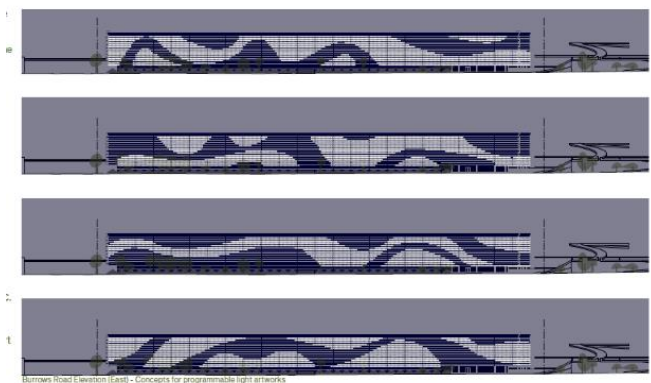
Precedent image, 1-3 Burrows Road, St Peters (Goodman)
